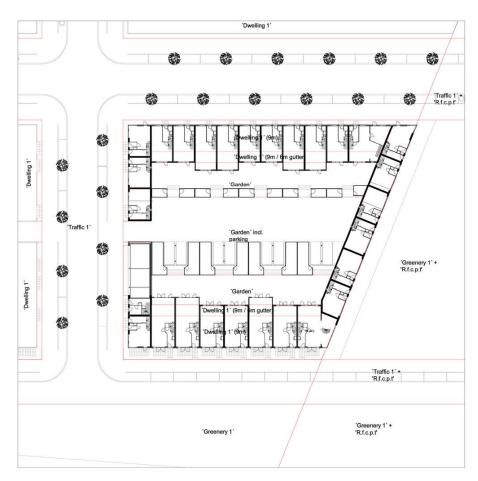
The buildingplans (ground floor) for IJburg block 44a laid over the 'Bestemmingsplan' map. The buildingplan follows the plots neatly.
